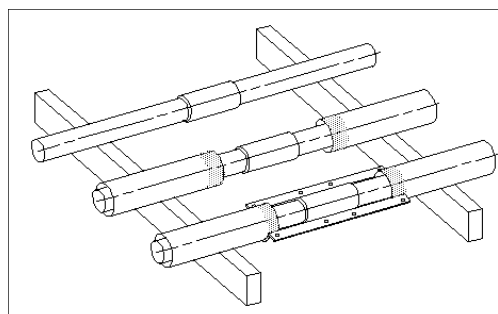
During layout, bonding and inspection, support the piping on 2x4 blocks to keep the joints clean and to keep bedding out of the pipe. Remove supports before burial.
